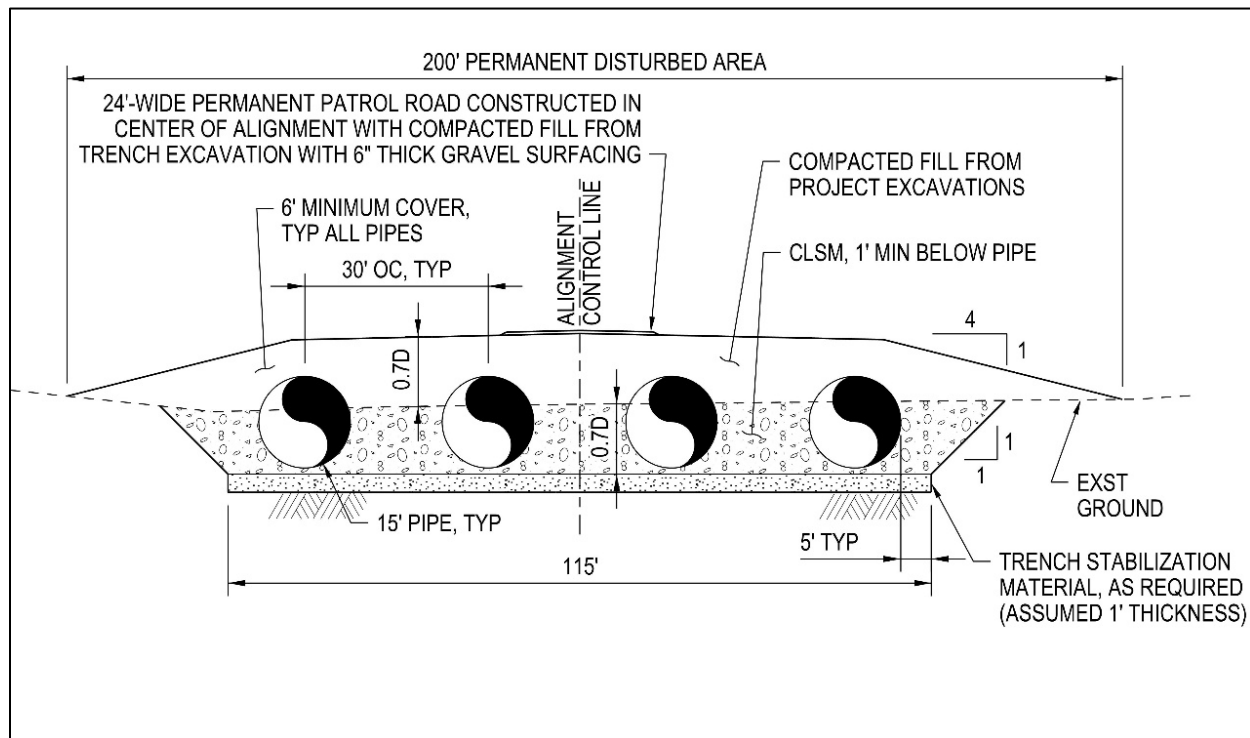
Typical Pipeline Trench between BRPP and Bethany Reservoir
